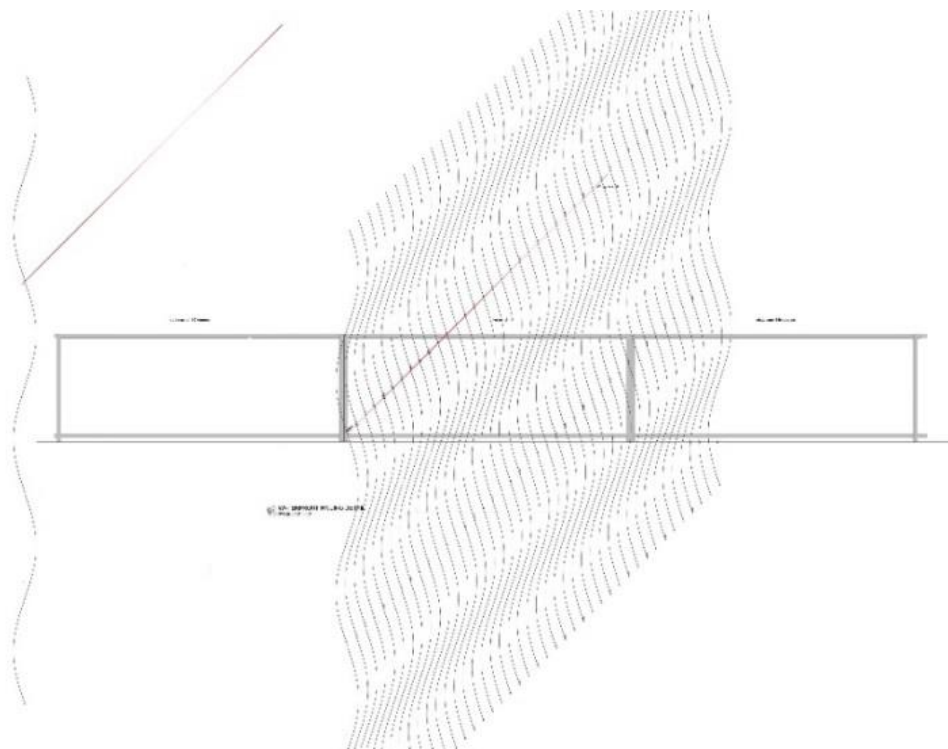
Sine Wave Parapet Railing Study, Ken Smith Workshop.
